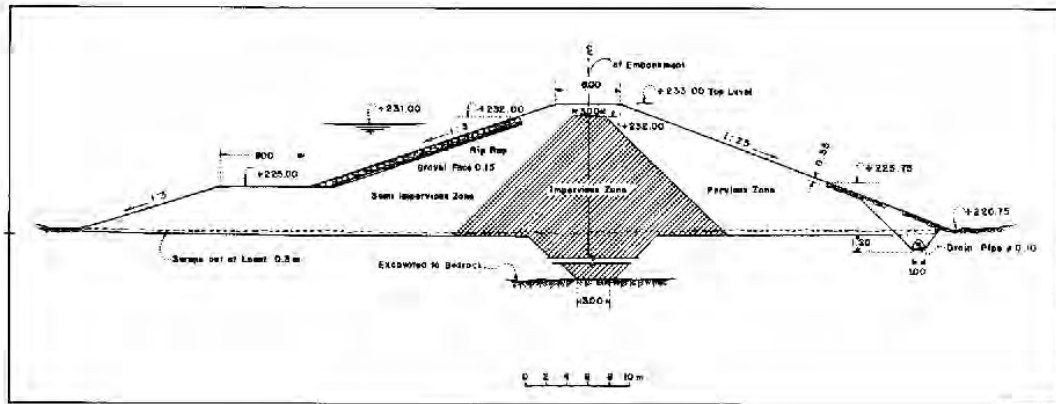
Cross-section of the Lam Sam Lai Dam.
